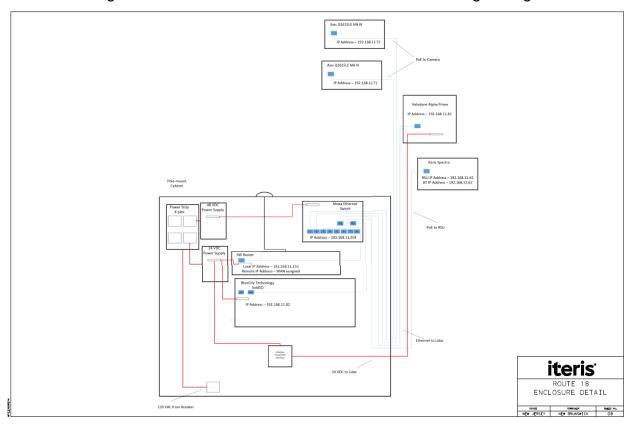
Cabinet Detail at Route 18 - VMS Sign Bridge
